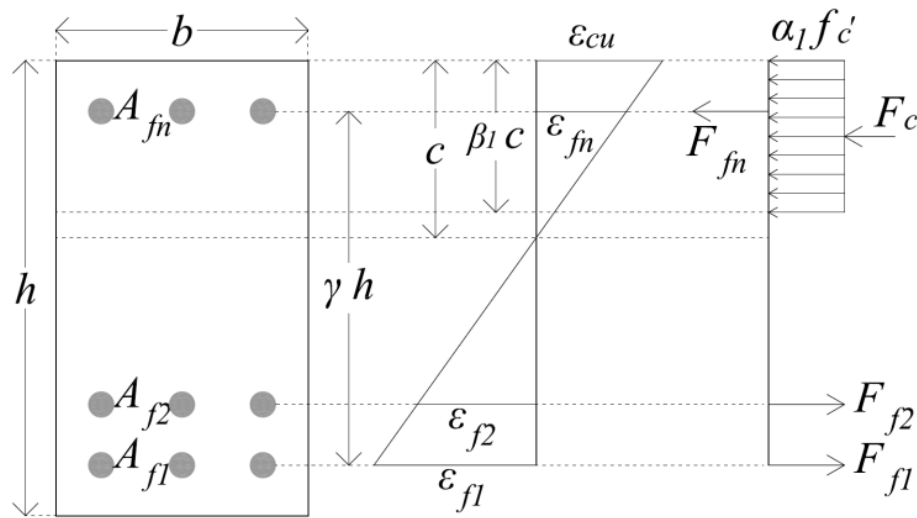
Concrete column cross-section reinforced with n layers of FRP bars
